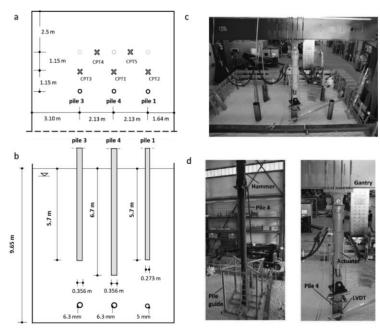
Schematic drawing of the experimental set-up a) top view, b) section and pics of the piles, c) the pile layout and d) installation and loading
